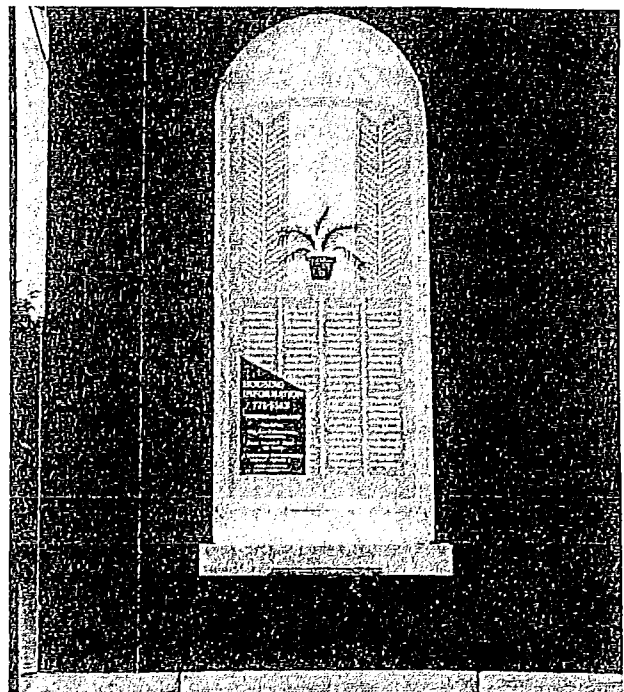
Painting trompe l'oeil scenes on plywood panels is a neighborhood friendly device. In addition, the small sign at the bottom left corner gives information for contacting the organization responsible for the care of the mothballed building. Photo: Lee H. Nelson, FAIA.
